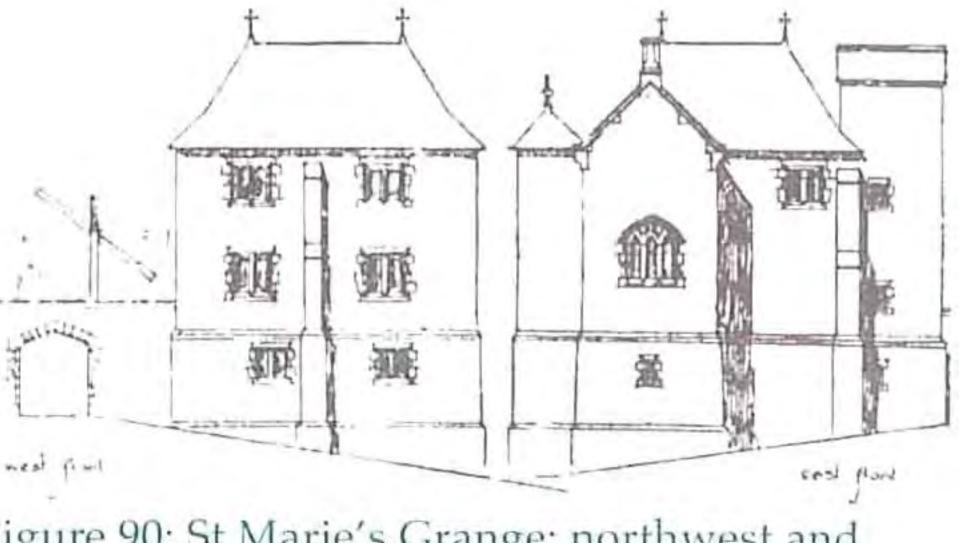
St Marie's Grange: northwest and southeast elevations Architectural review, vol 4 (1897-8), p 160.
